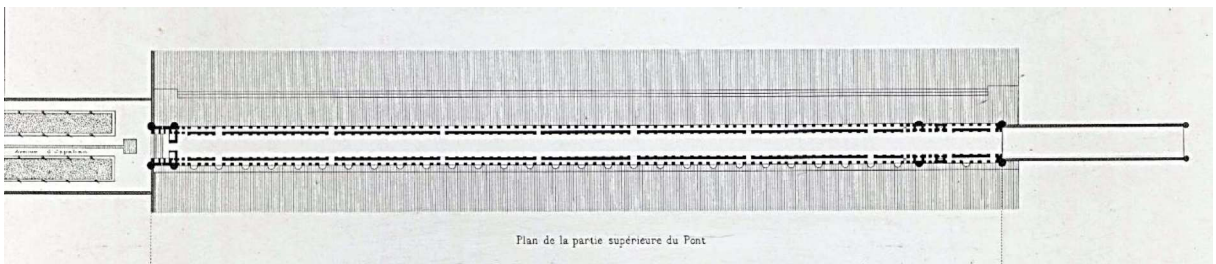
Plan of the second floor of Si-o-se pol bridge, wikimedia.org, 1840
